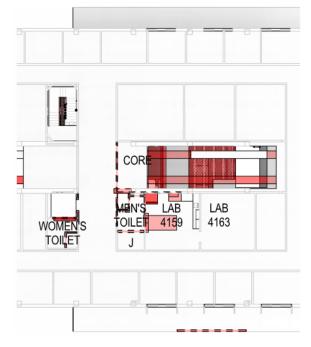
Phasing Diagram Demo Floor Plan, Level 4
